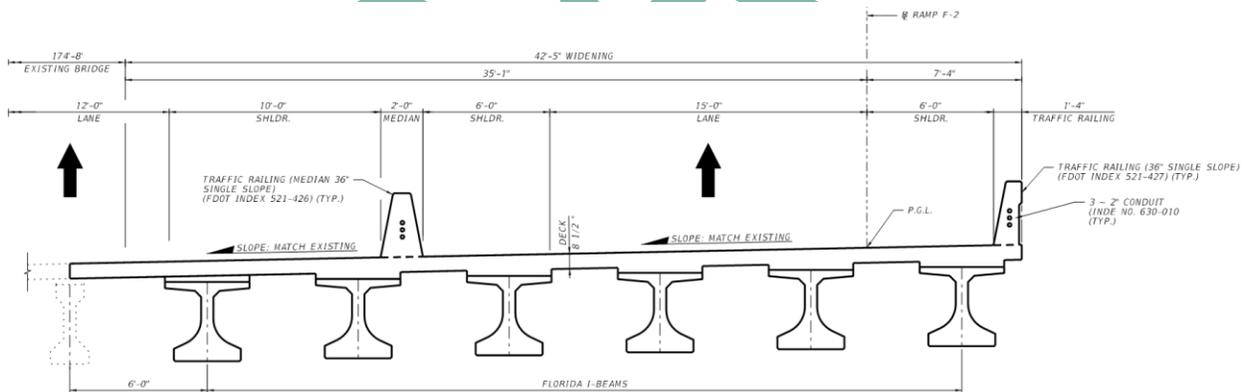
Bridge Typical Section (Bridge No. 17)
